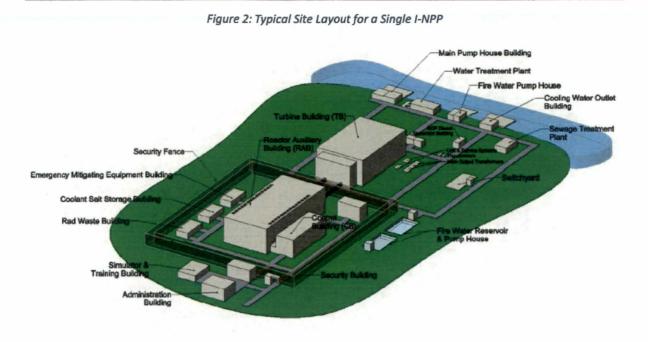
above represents a simplified plant layout identifying the arrangement and configuration of the major buildings, structures, and boundaries of an I-NPP site. A "generic design site envelope," is used to develop the IMSR® site design and encompasses generic site parameters used in Canada, the U.S. and European countries relevant to nuclear plant siting.
